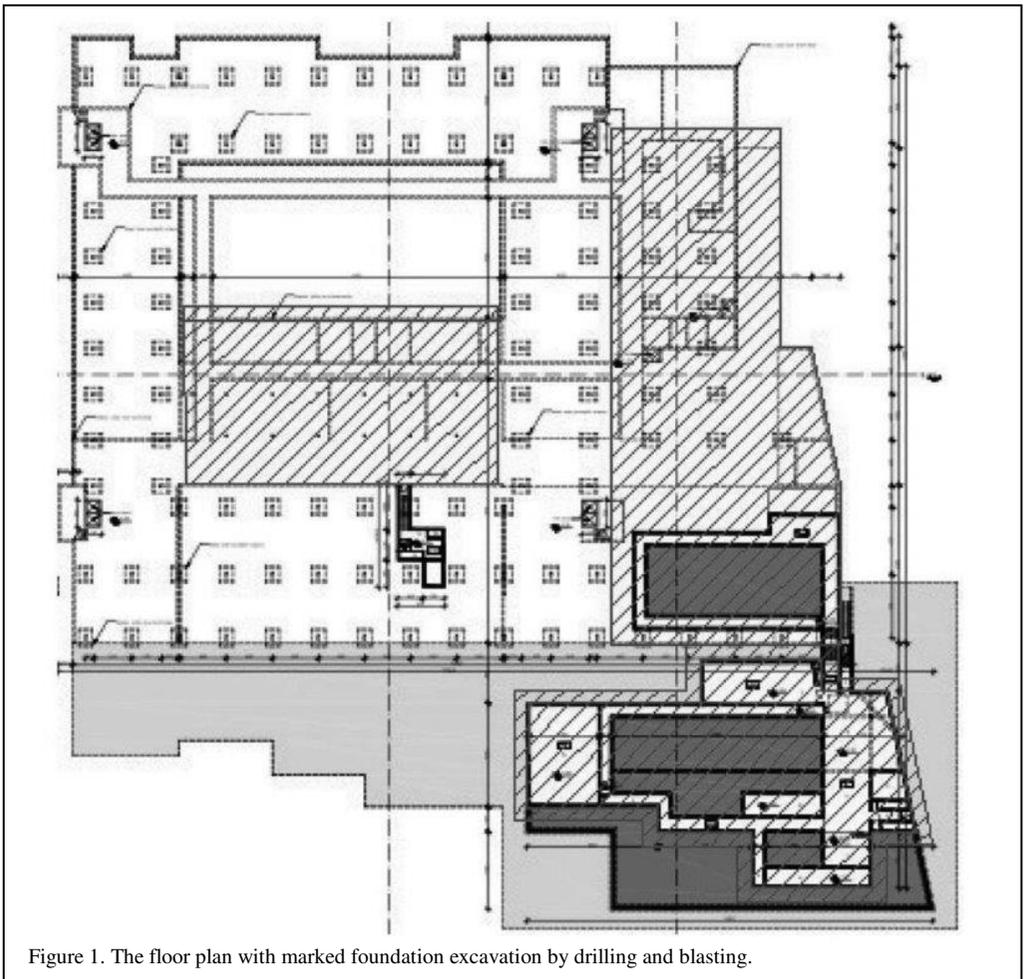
The floor plan with marked foundation excavation by drilling and blasting.
